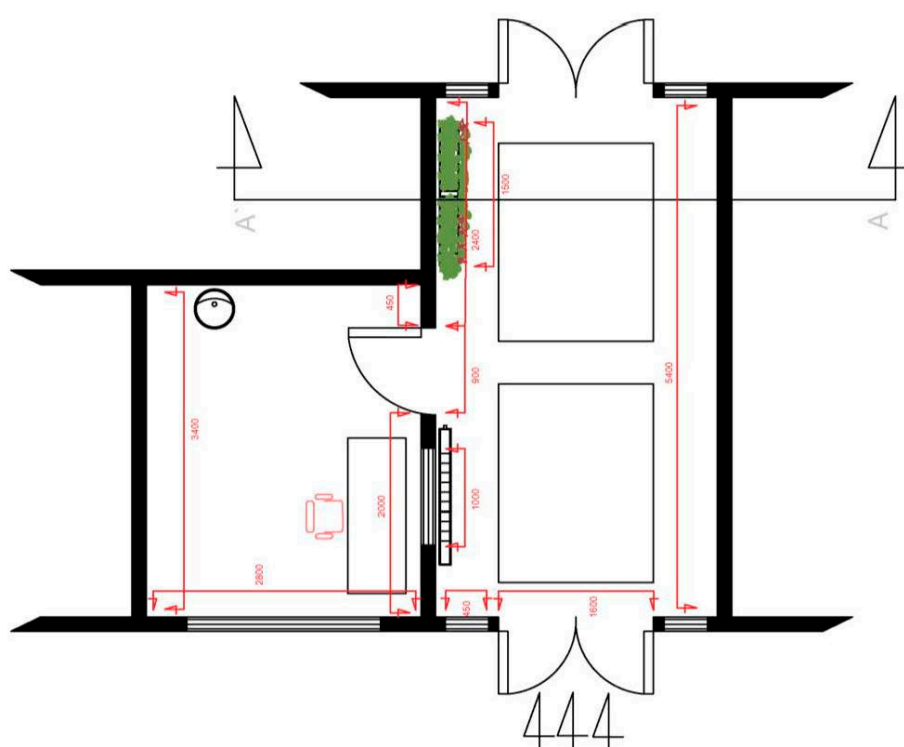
Floor plan of the entrance hall in PK 10- room with the green wall.
